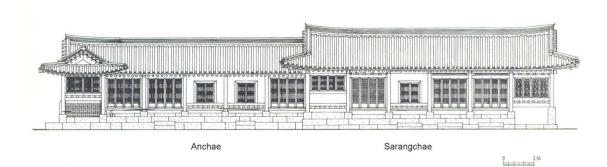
Anchae, Sarangchae Front Elevation (N. Zu 2003)
